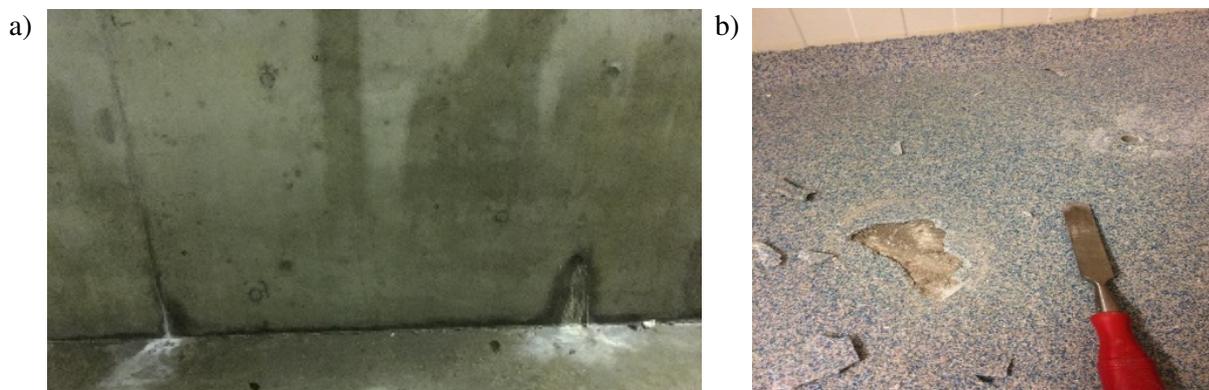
Examples of issues caused by leaking groundwater through concrete floors in underground structures including: a – unsightly leaks, collection of water and long-term durability concerns; b – poor performance of floor coatings or covering
